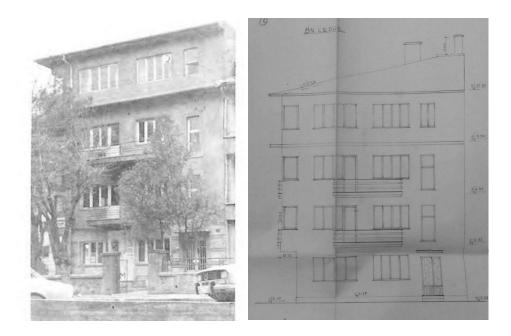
The first building of Mülkiyeliler Birliği, Berker Apartment, 1975.
